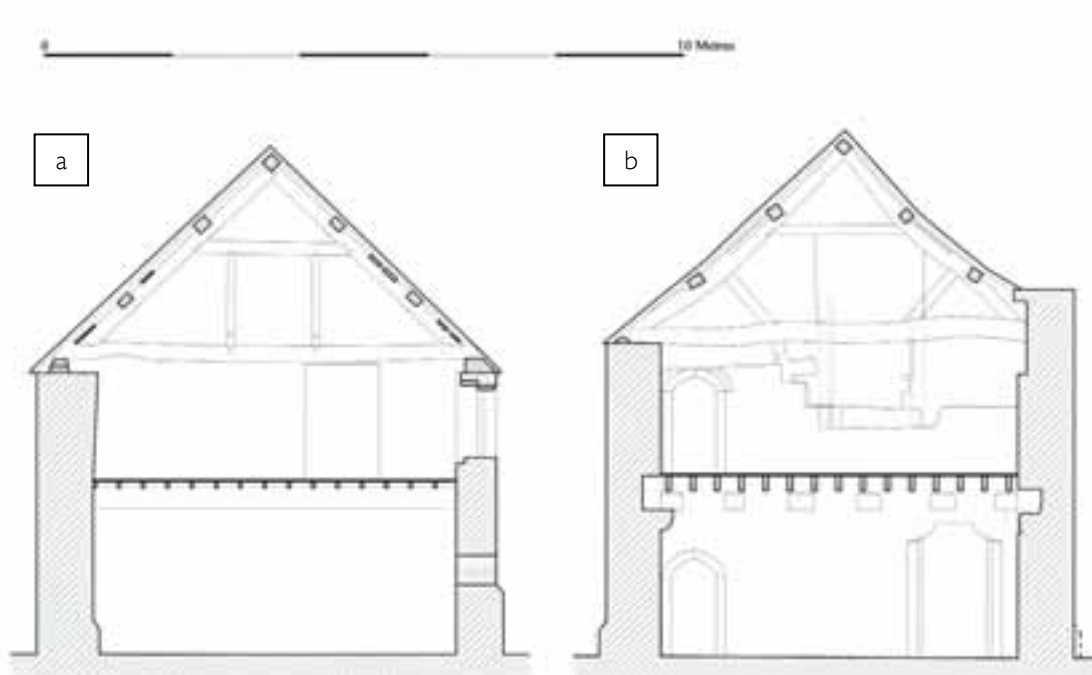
a) Truss T4, floor and section from NW Farm Building, and b) Truss T5, floor and section from Solar Wing, both of Storeton Hall Farm outbuilding. Based on a figure supplied by Mark Fletcher, Matrix Archaeology
